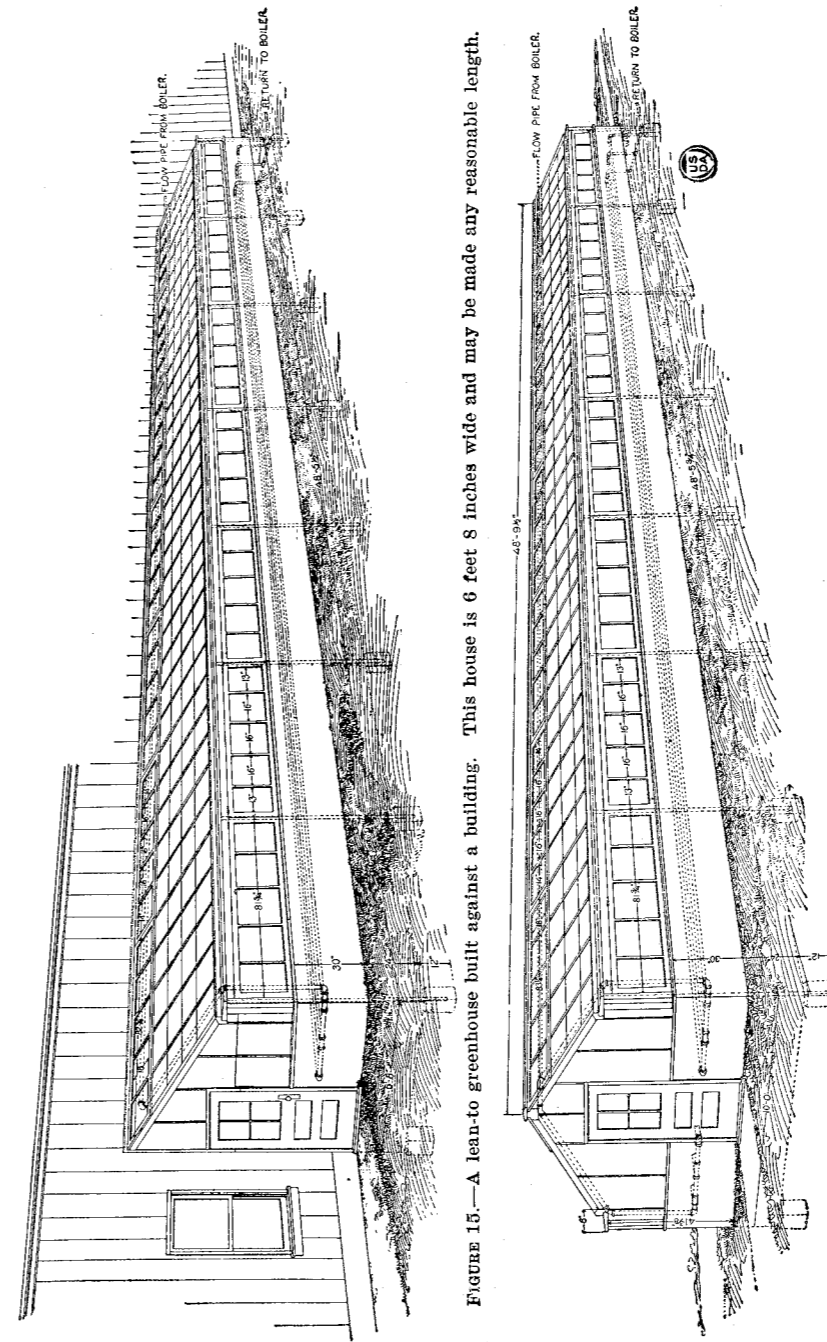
A lean-to greenhouse built against a building. This house is 6 feet 8 inches wide and may be made any reasonable length.
